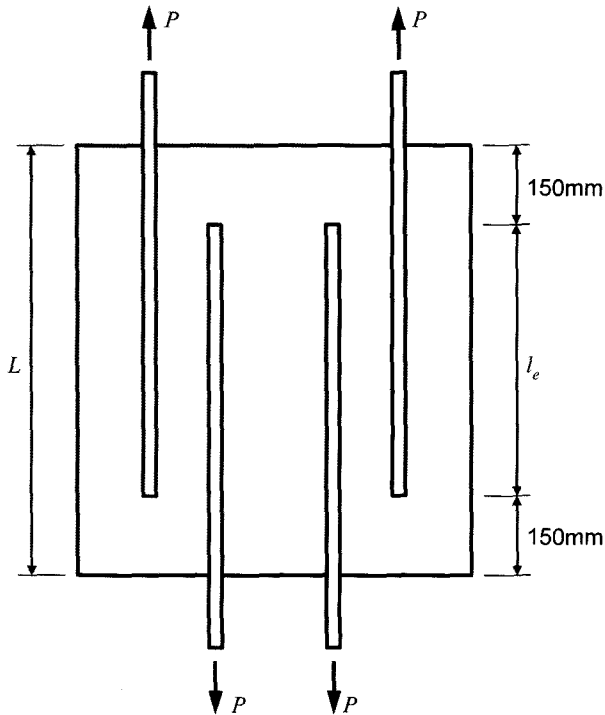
Typical noncontact lap splice specimen used by Sagan et al. (Transverse reinforcements are not shown.)
